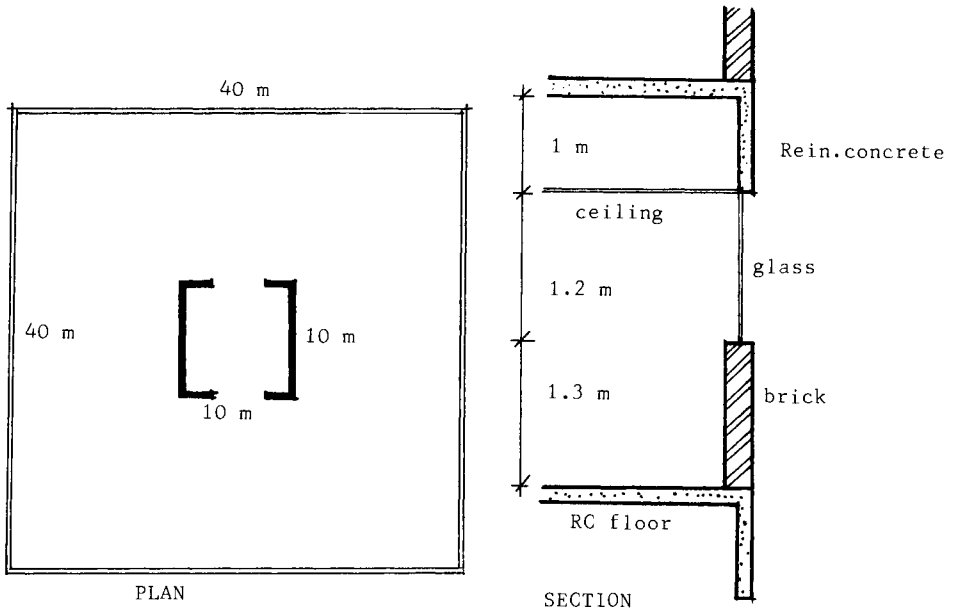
(a), 6(b) Plan and section of typical floor of prototype building
